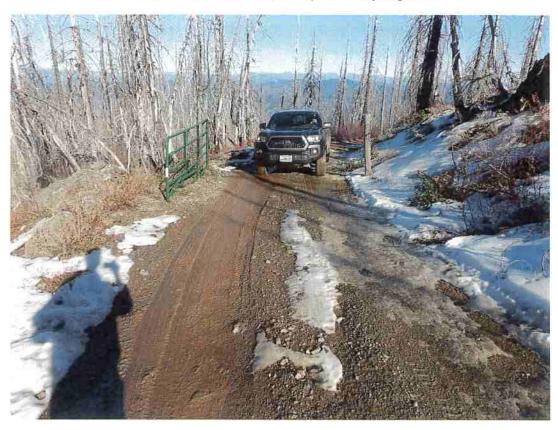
RP 5. Vehicle traveling south, photo taken facing north.
